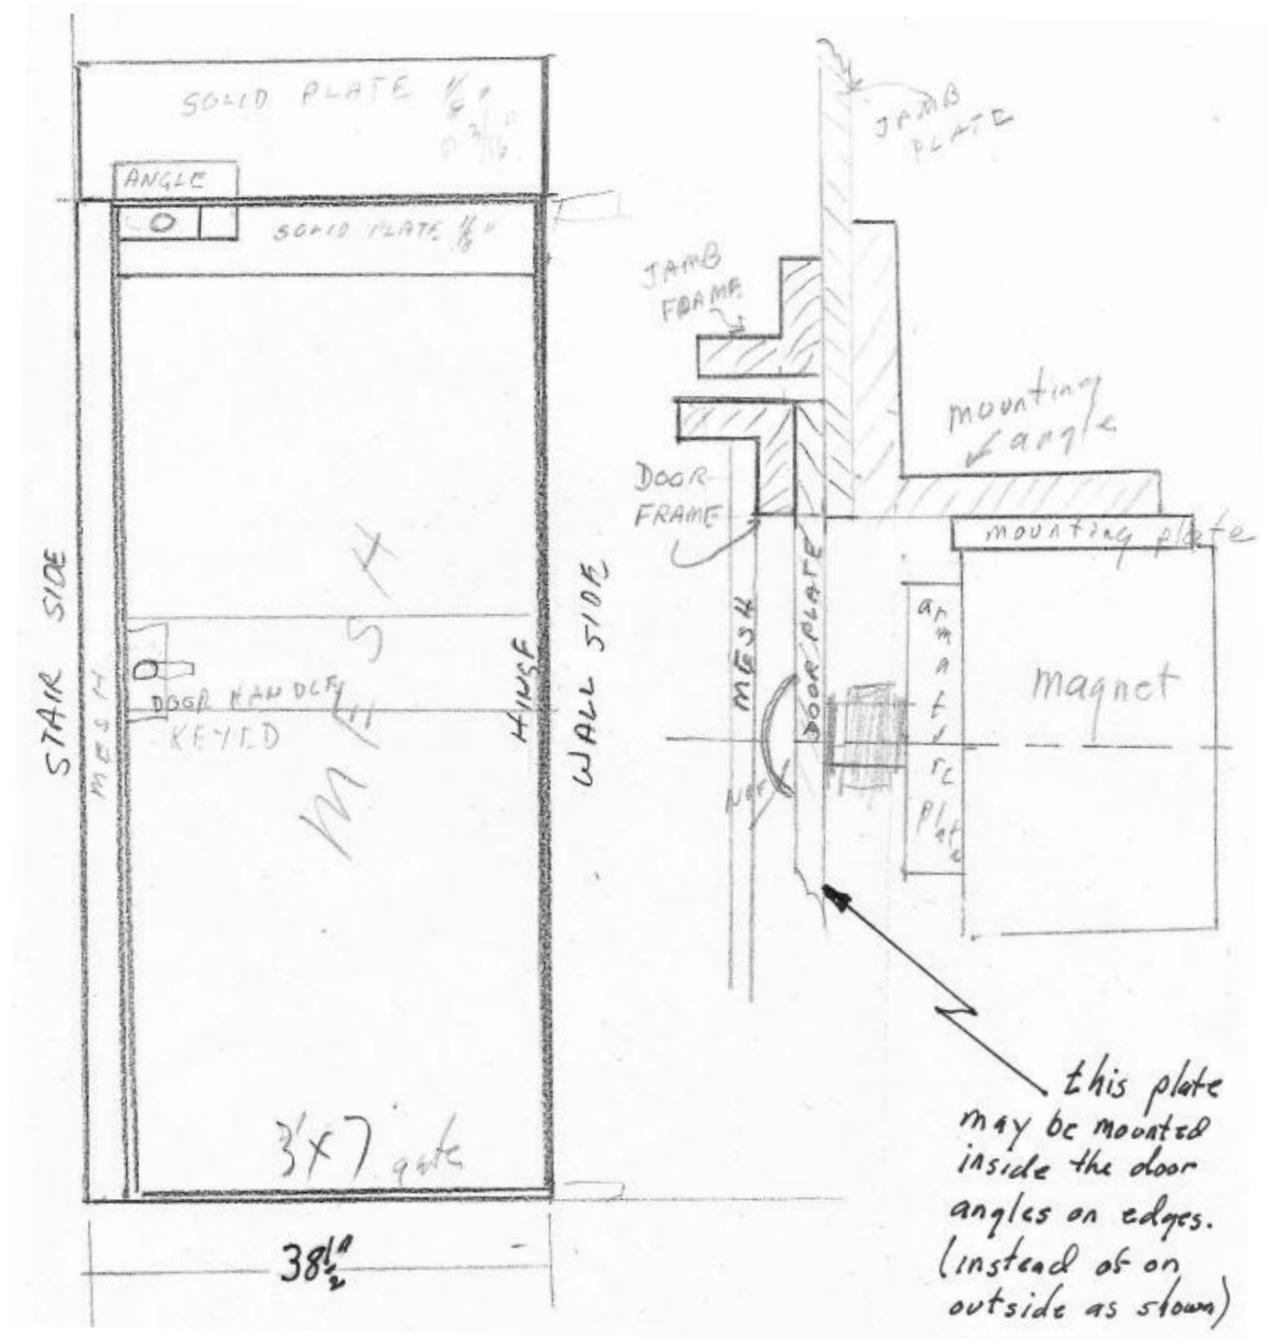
Sketch of gate (looking downstairs or east) with sketch of electric magnet lock installation.
